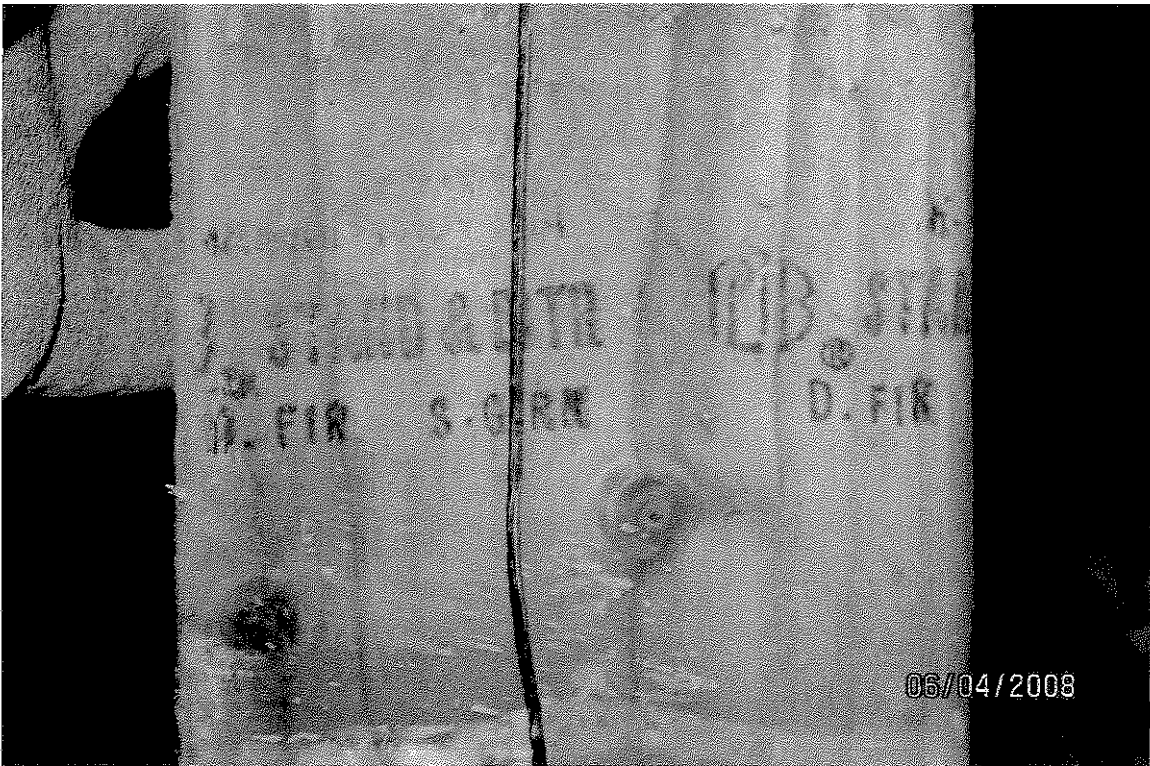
Standard and Better (STAND&BTR) lumber stamp on 4x4, sample with DOB #41035C.
